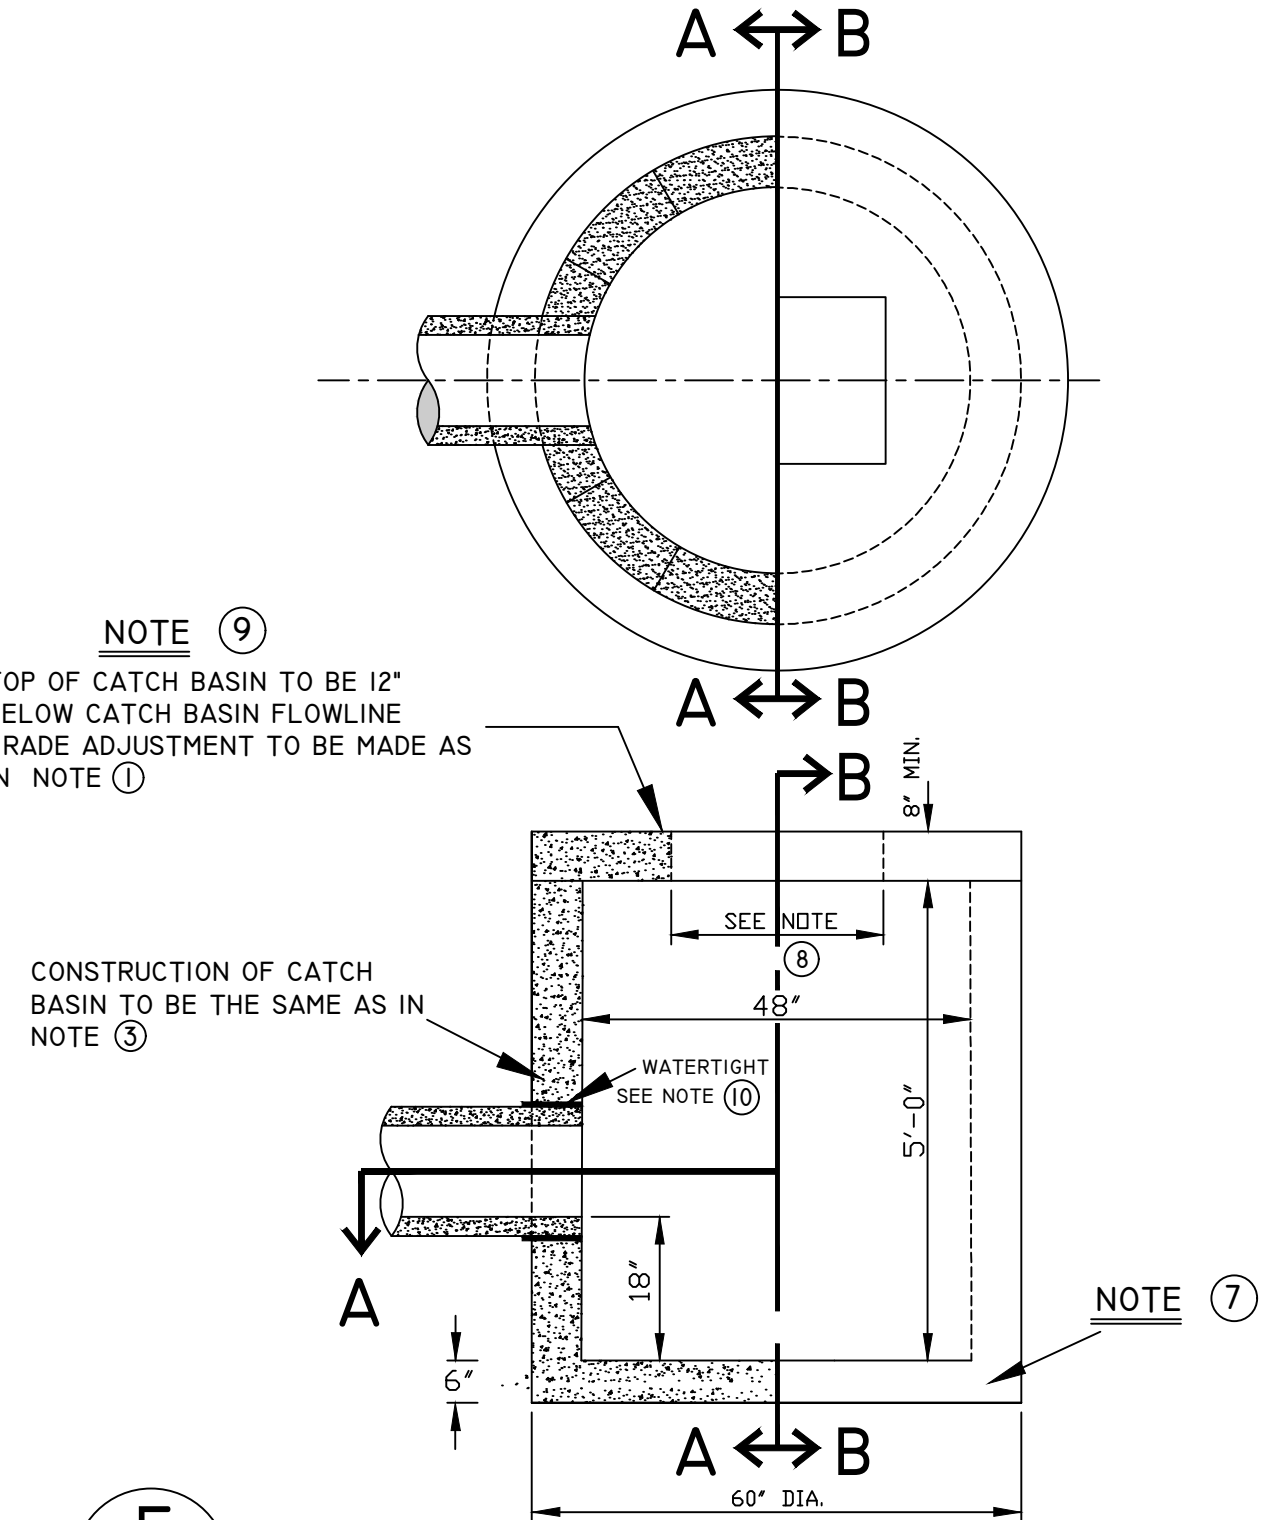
DETAILS OF STANDARD MANHOLE FOR 30" PIPE OR SMALLER
